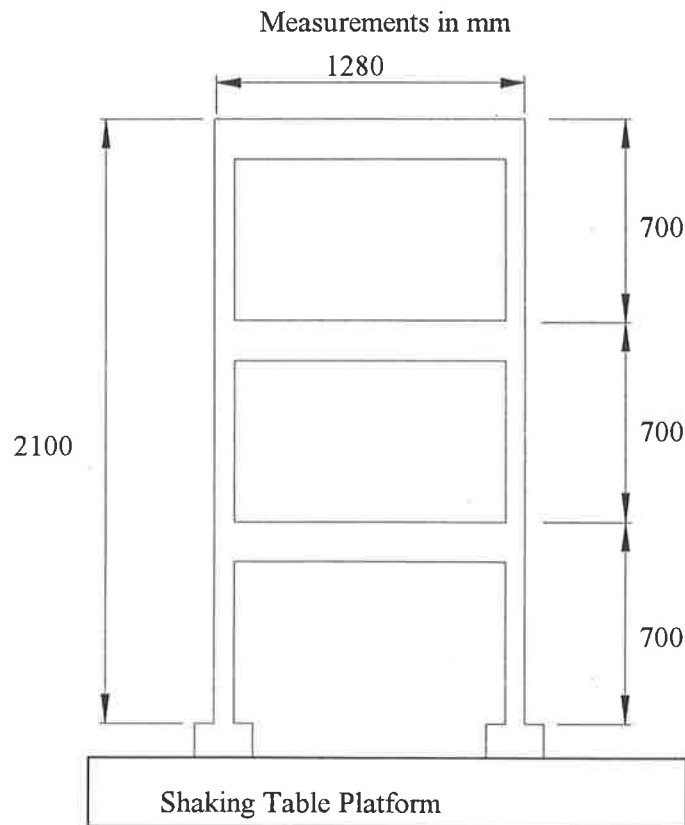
1/5-Scale Reinforced Concrete Frame Tested at The University of Adelaide
